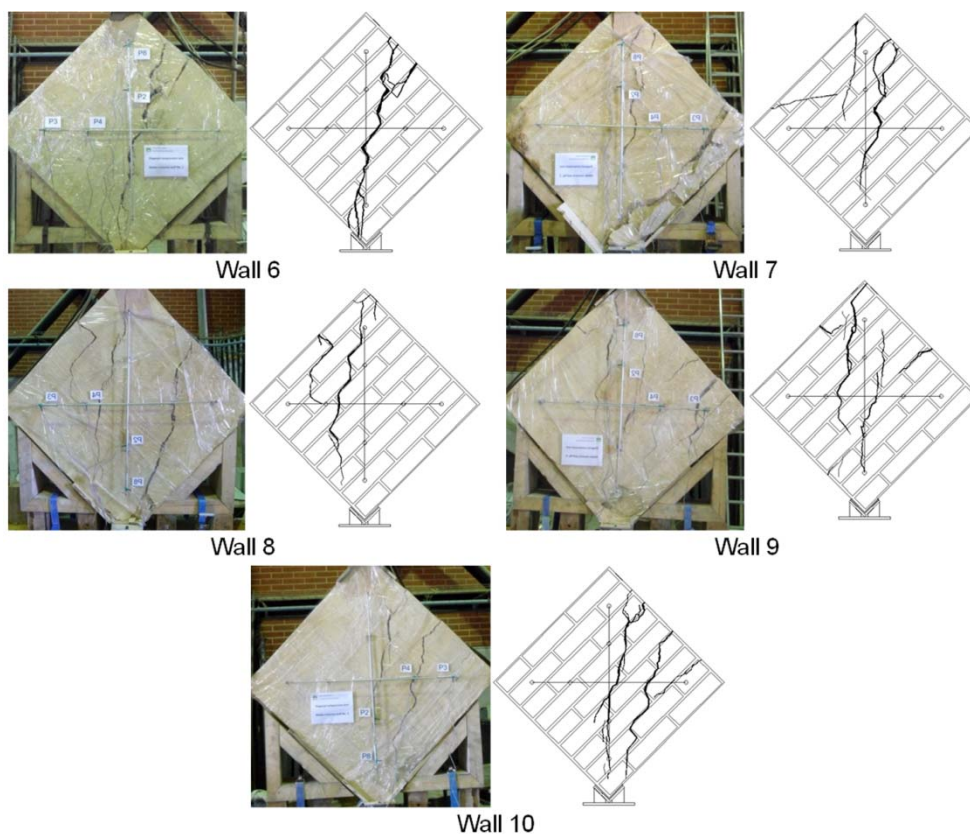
Damage pattern on the adobe walls tested in diagonal compression.
